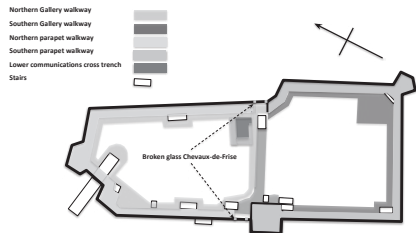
Gallery walkways, parapet walkways, stairs to parapet walkways and lower communications cross trench
